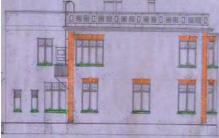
Highlighted areas of expressed brick elements on the east elevation as detailed by Anscombe on the original plans.
